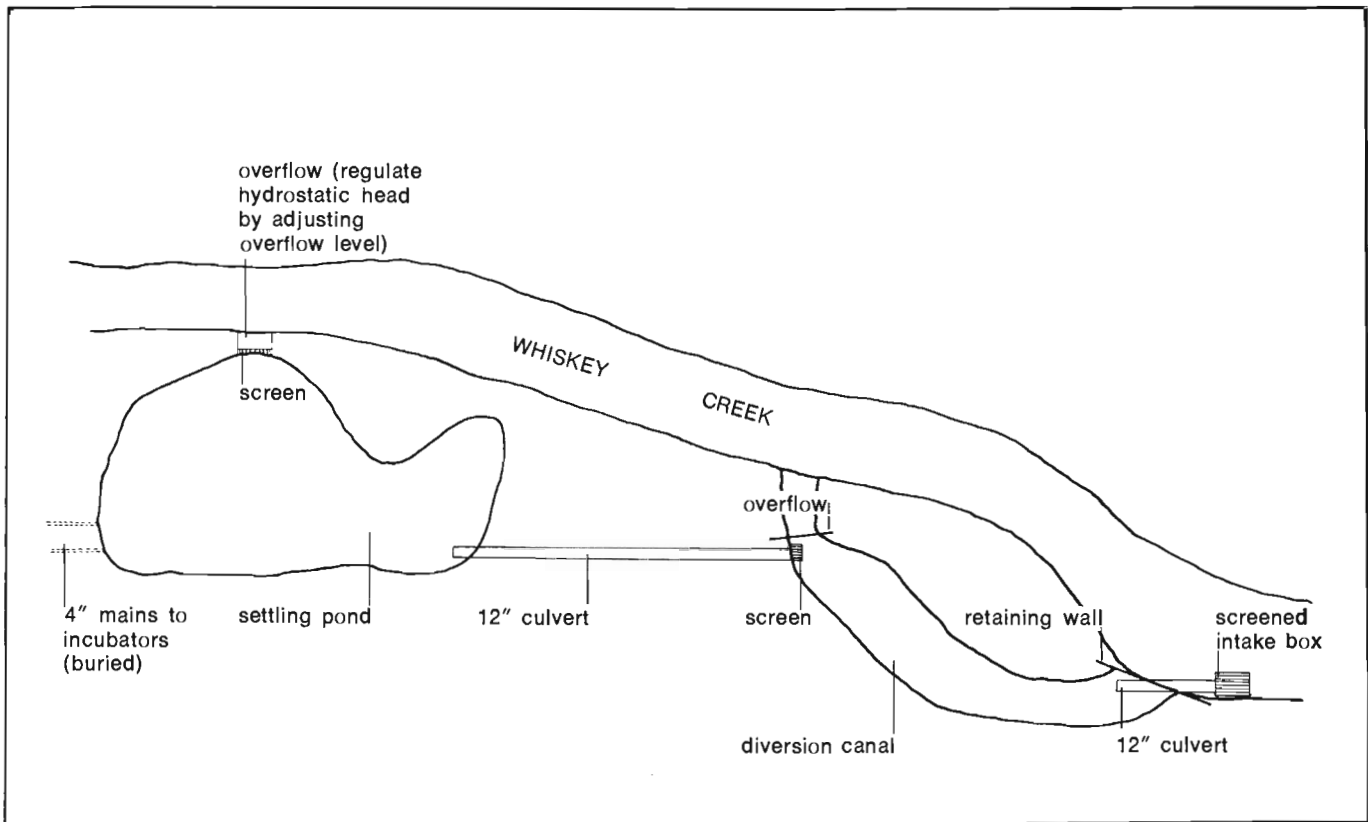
Overview of hatchery water system from intake culvert to settling pond.
